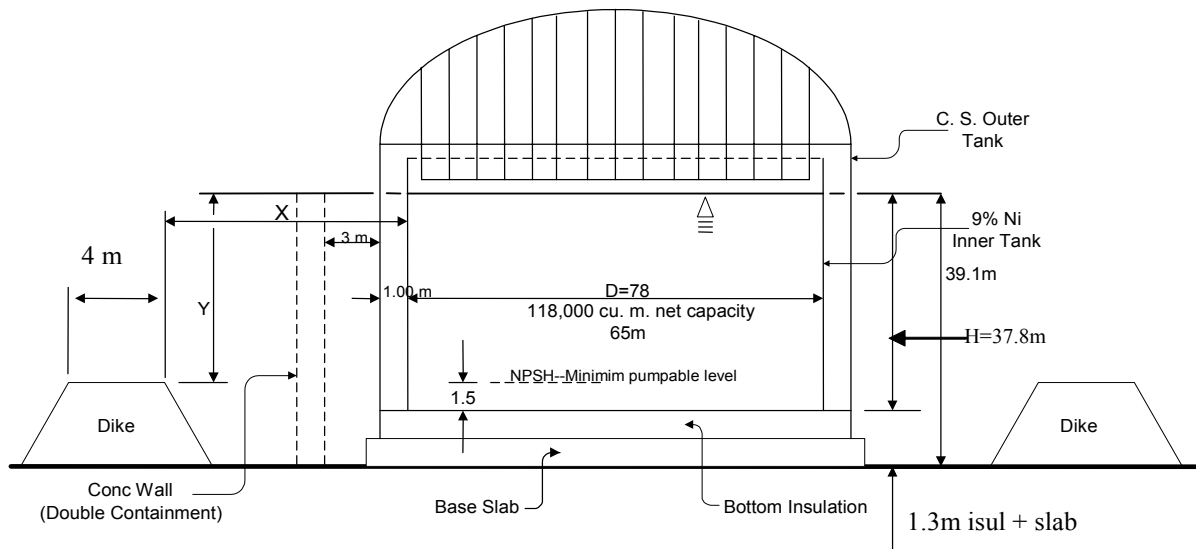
Detail for Single Containment LNG Tank with Dike Arrangement
